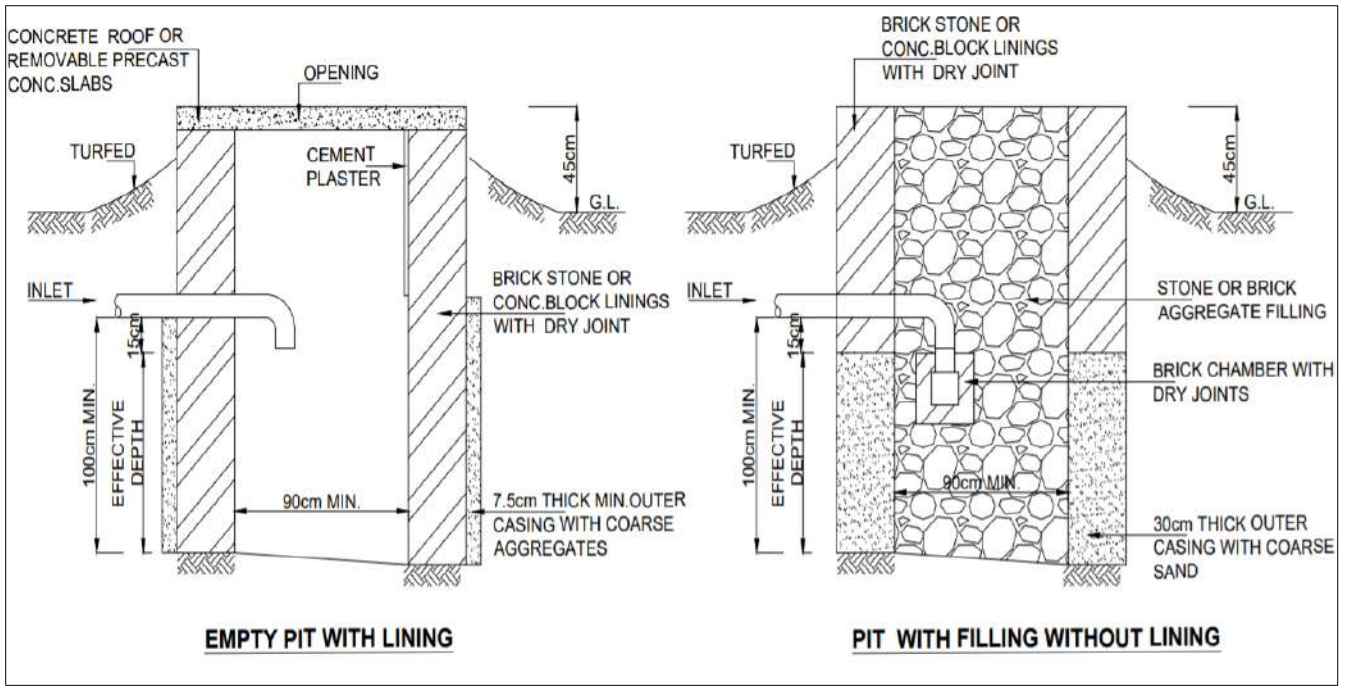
Typical Details of Soak Pit Disposal Arrangement
